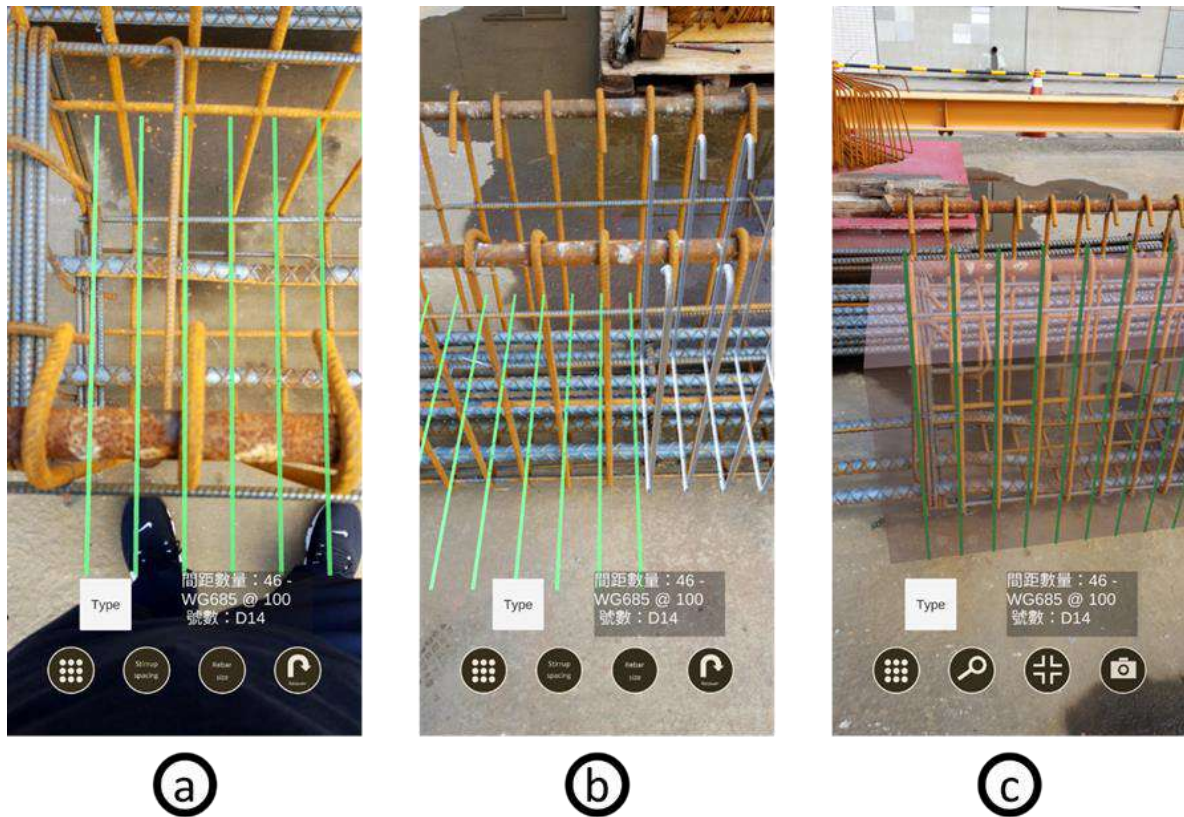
Snapshots of the AR-supported rebar inspection application in spacing inspection task. (a) On the left side of the stirrups, planar virtual bars are superimposed well on the bottom part of the stirrups. (b) In the middle of the stirrups, stirrups have a little deviation from the planar virtual bars. (c). The orientation of the planar virtual bars is changed to superimpose vertically on the front side of the stirrups
